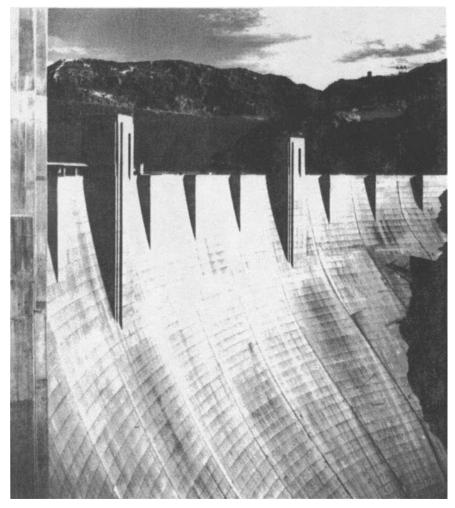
Side View of Concrete in Hoover Dam on the Downstream Face
